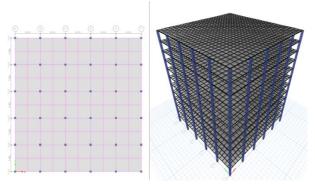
Rectangular Shape building with Flat Slab without drop panel
